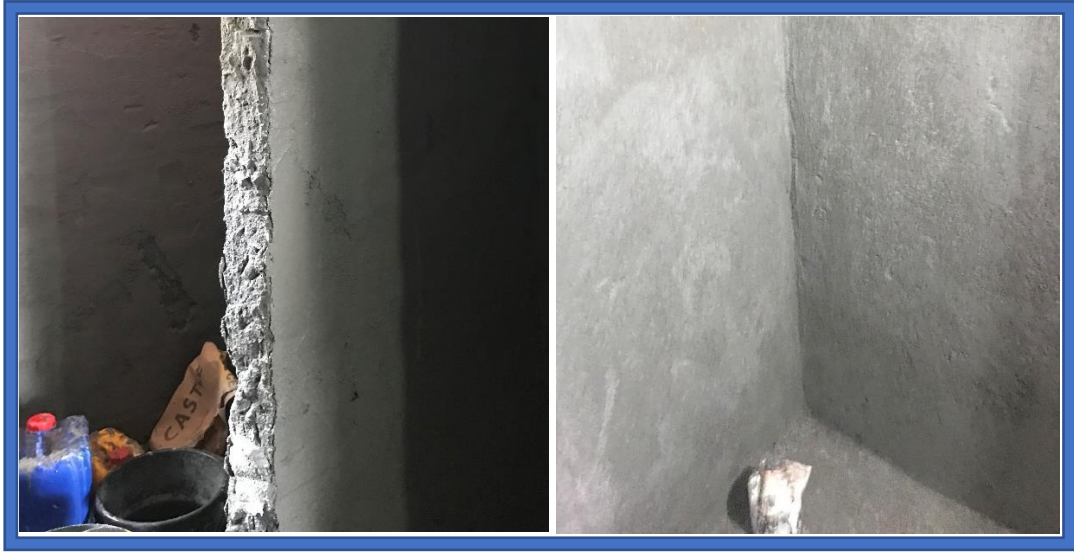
After the Cementitious Waterproofing Slurry are applied on the wall.
